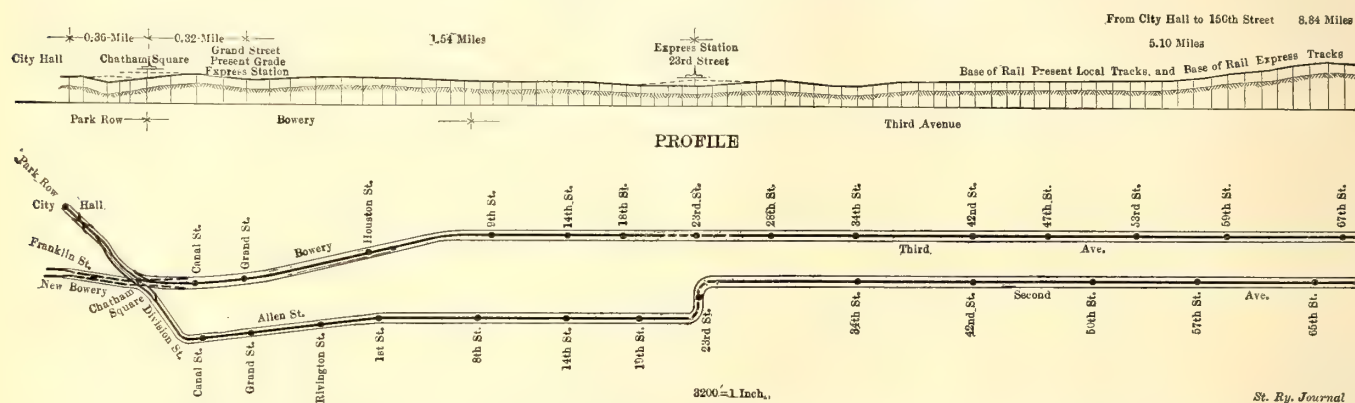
PROFILE AND PLAN OF PROPOSED EXPRESS TRACKS ON PRESENT EAST SIDE ELEVATED RAILWAYS
